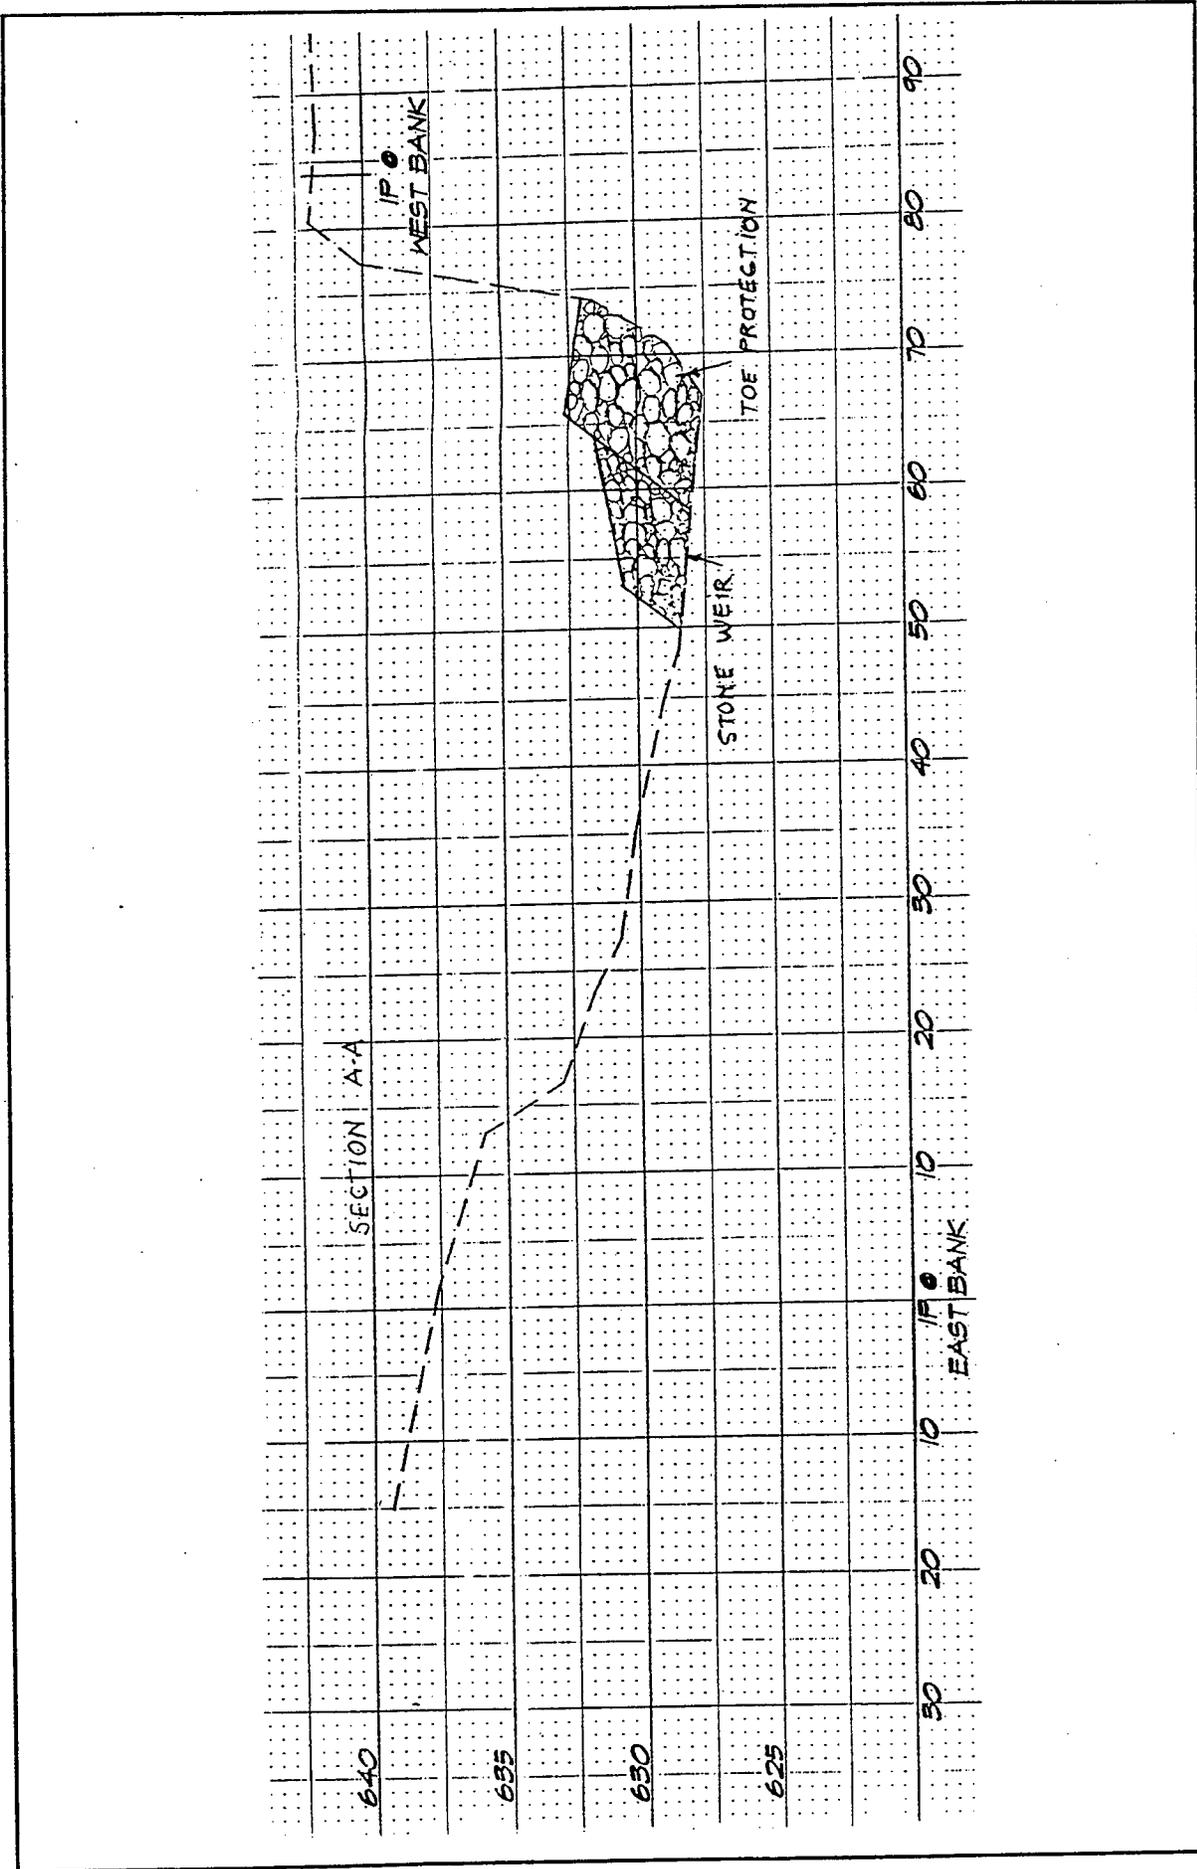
Spoon River alternative 1 protection design - typical cross-section (Section AA).
